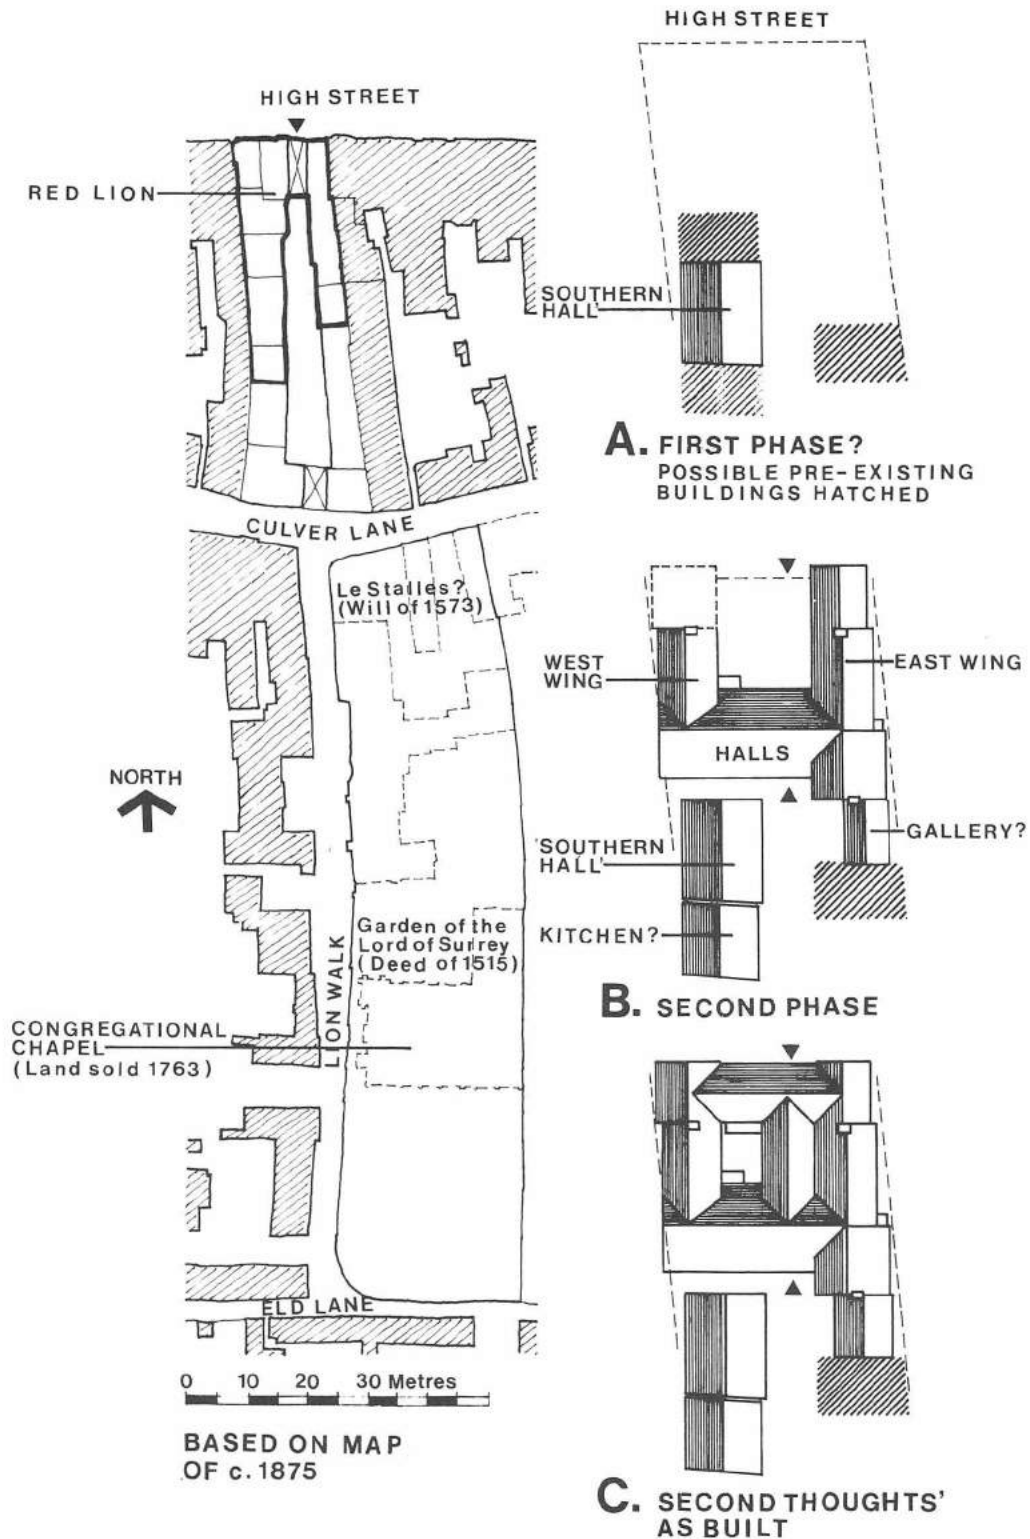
The Red Lion, Colchester. Site location (left) and general phase plan (right).
